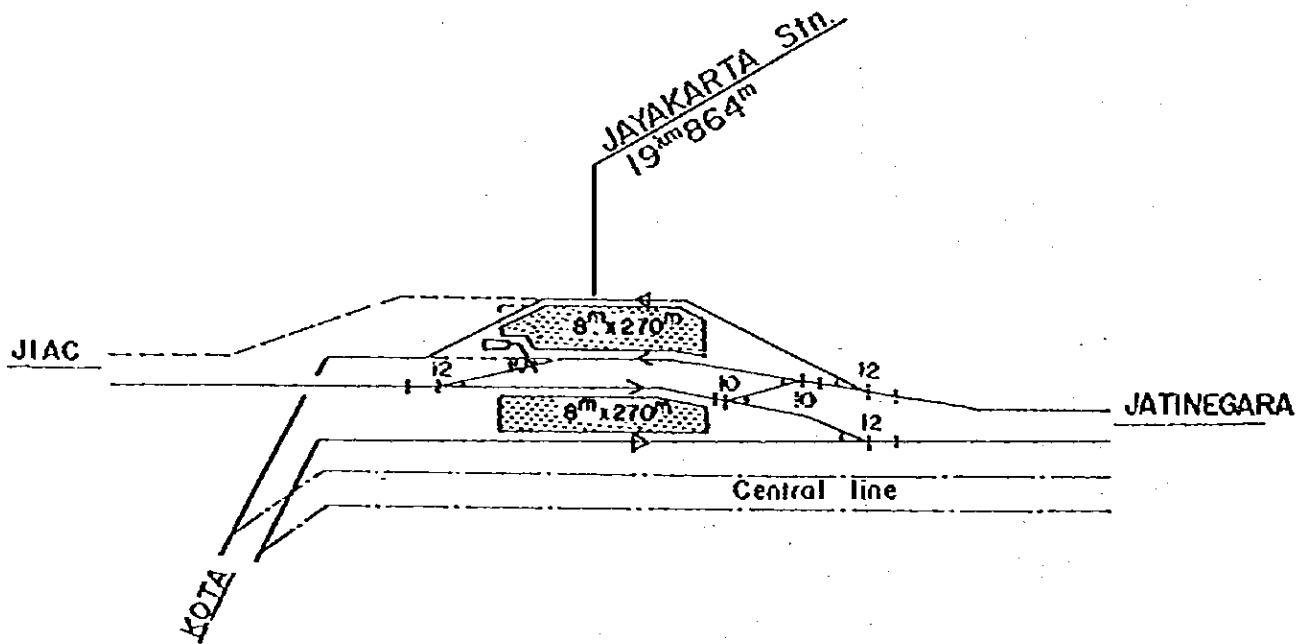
Jayakarta Station Schematic Layout (Elevated Plan)
